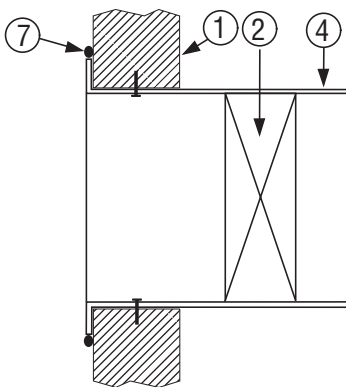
Out of Wall damper with flanged sleeve for grille mounting
